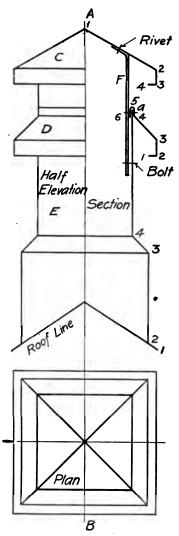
Half Elevation, Section, and Plan of a Square Ventilator.
